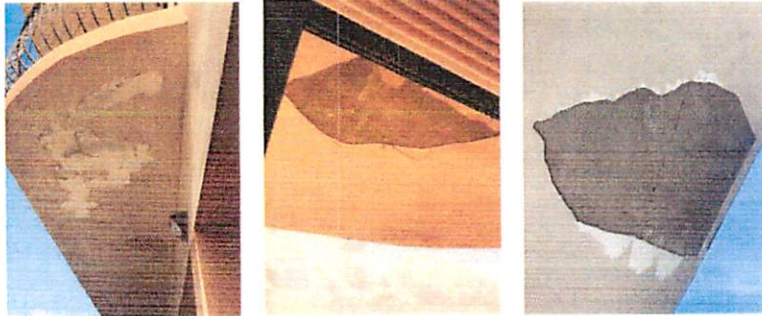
Figure D: Balcony Soffit paint spalling in units 208, 703, & 1301.
